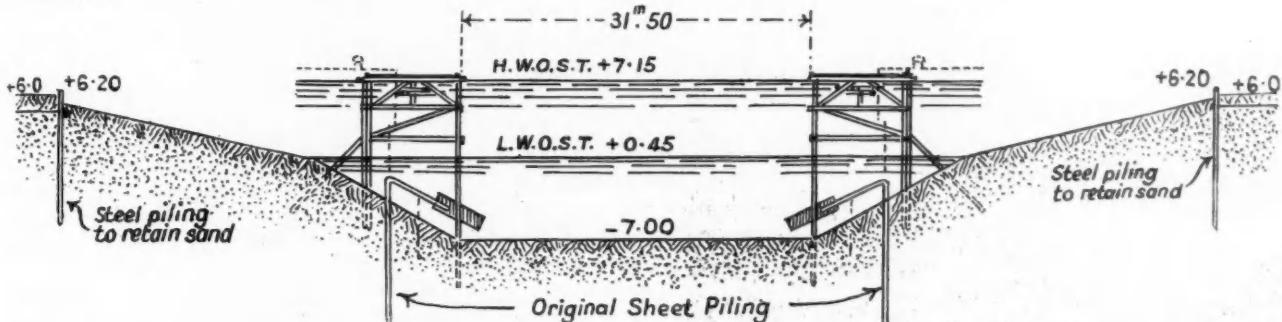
Cross-section of Lock, showing staging and piling of scheme for temporary repair, and state of original sheet piling.
